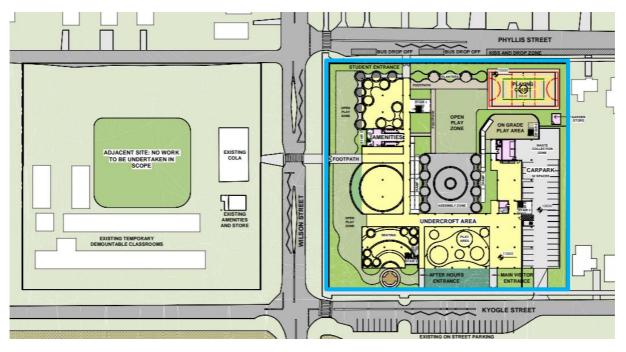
Ground floor plan showing the proposed layout of the new school buildings in the eastern parcel (outlined blue) of the LSPS site. (Source: EJE Lismore South Public School (LSPS) SINSW #230301 Site Plan Ground Floor dwg A-020)
